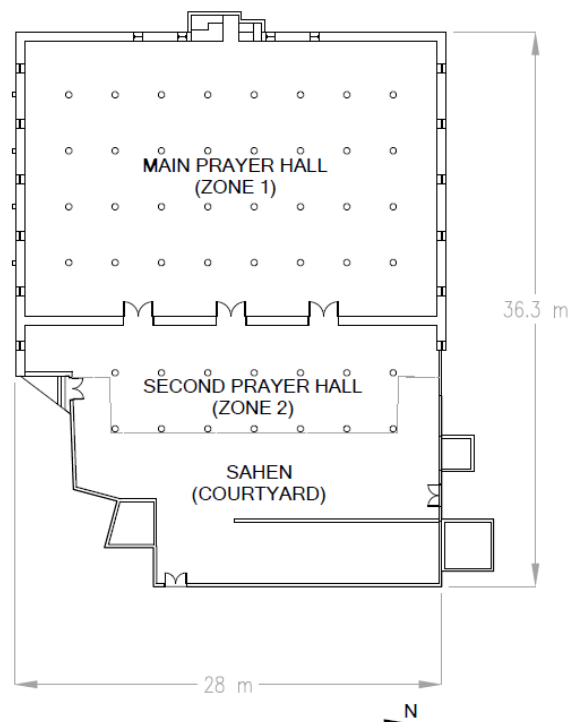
Ground floor plan of Aal Hamoodah Mosque
